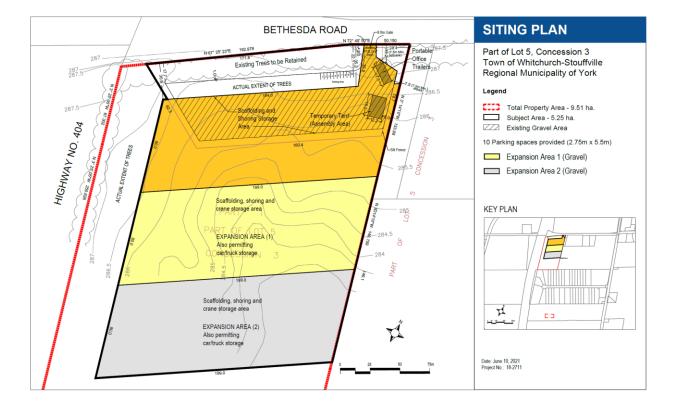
Proposed Plan 2021 for Temporary use by-law
